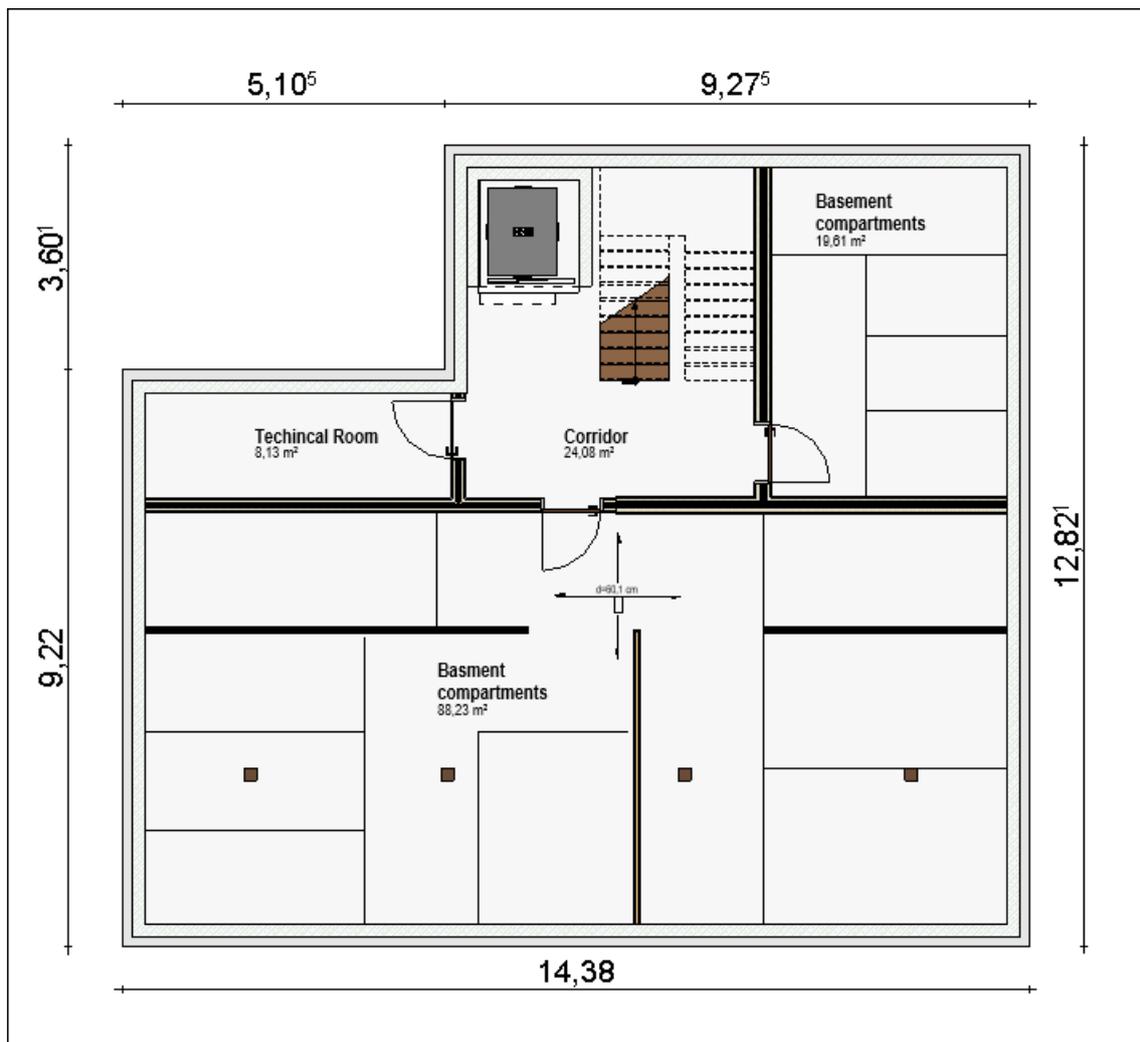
Floor plan of the basement (screenshot in *Revit*)
